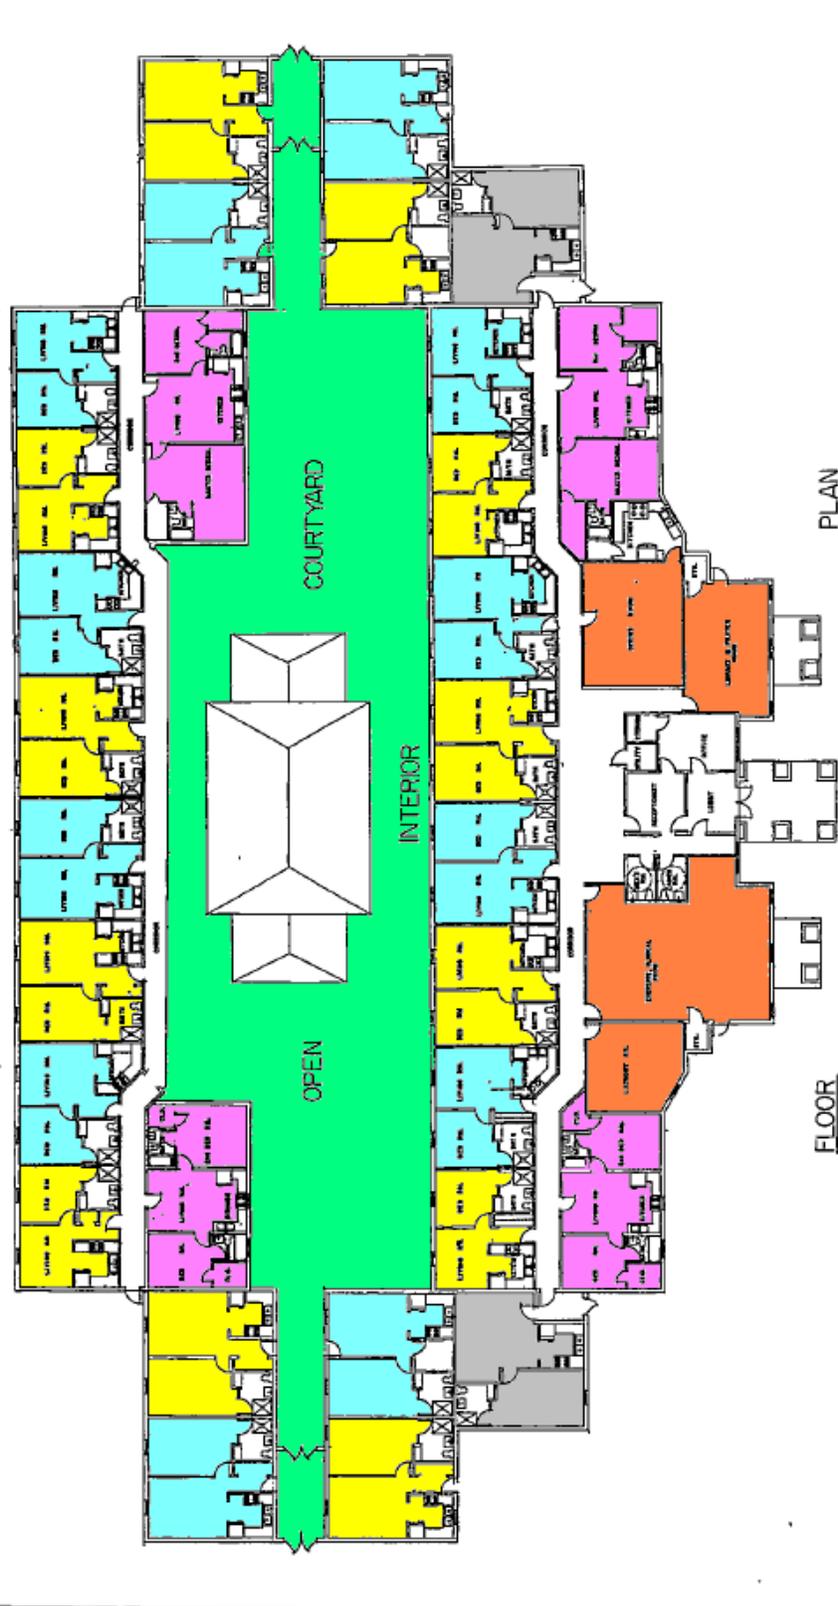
Proposed 30-Unit Site Plan with Open Courtyard
